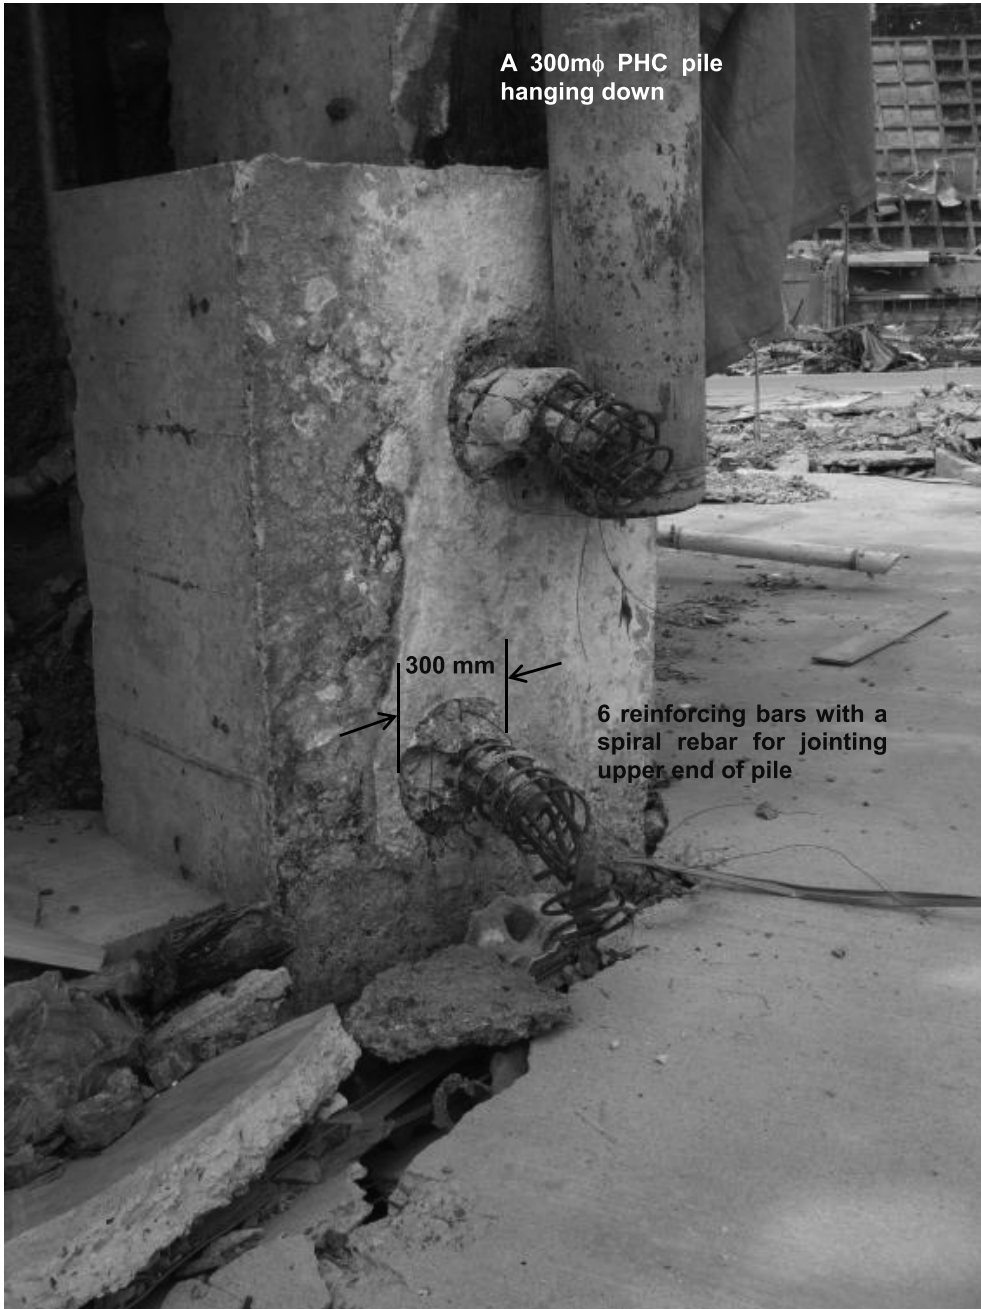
Detail for Jointing pile heads for Building #3: Detail of rebars for jointing a pile head was exposed. There are 6 rebars coiled in a spiral bar for each pile head.
